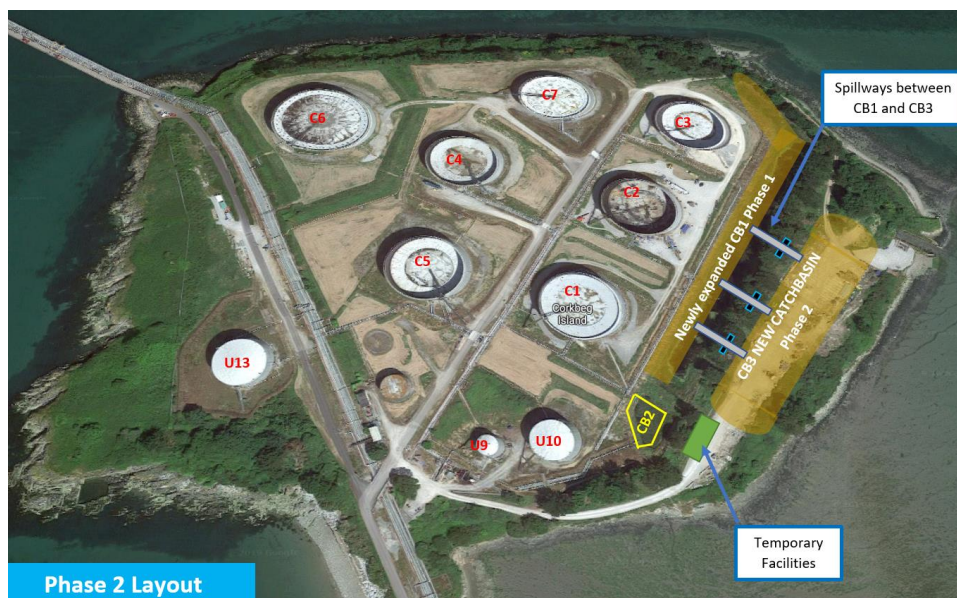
Indicative layout of Phase 2 (which will be subject to a future planning application)
